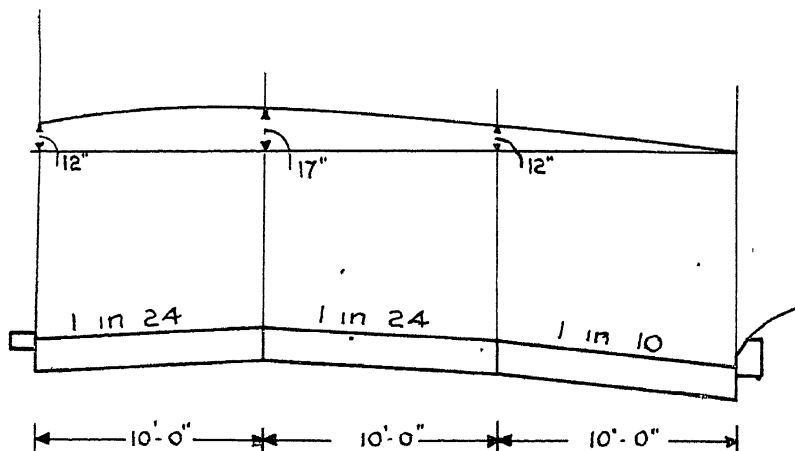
CROSS SECTION OF 30 FT. CARRIAGEWAY SHOWING VARIABLE SUPERELEVATION IN CONCRETE OR TAR MACADAM.
